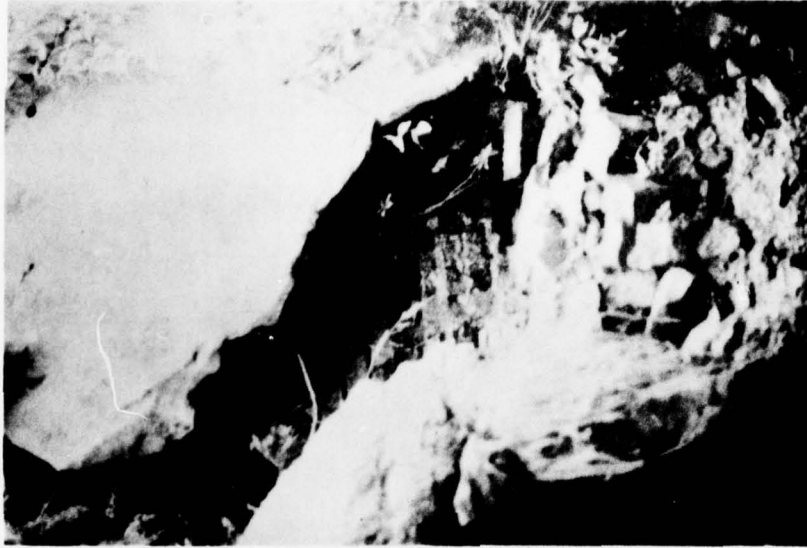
Exposed brick facing under spalled and displaced gunite facing at right abutment.
